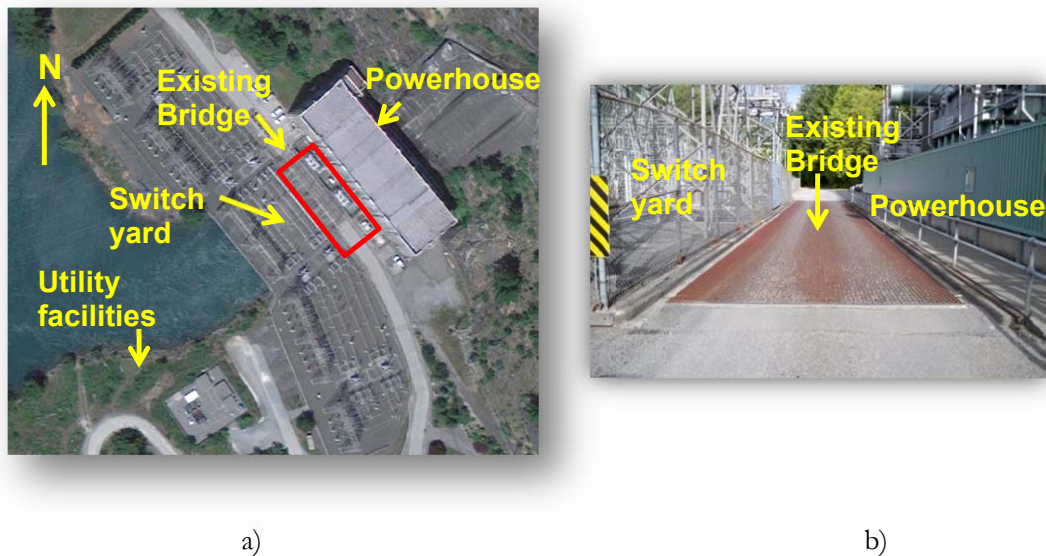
Location and View of the Bridge, a) Aerial View, b) Elevation View
